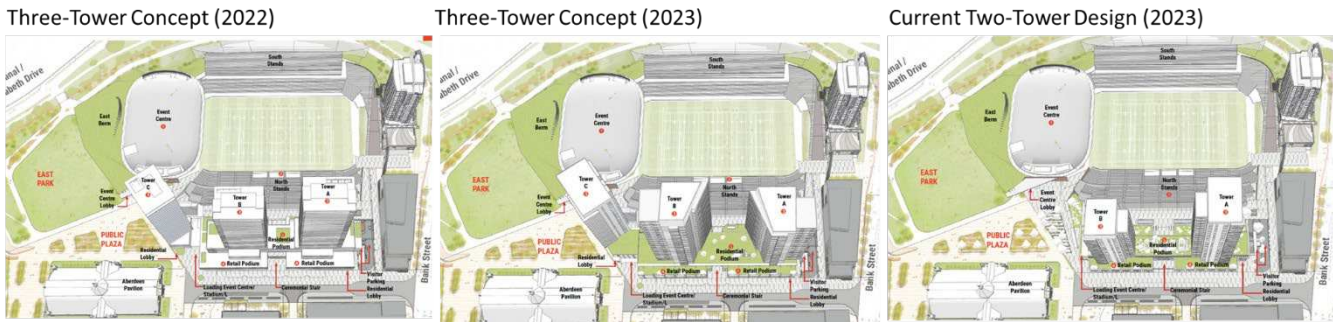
Concept Design Evolution resulting in current 2-tower plan with additional plaza space (right).
